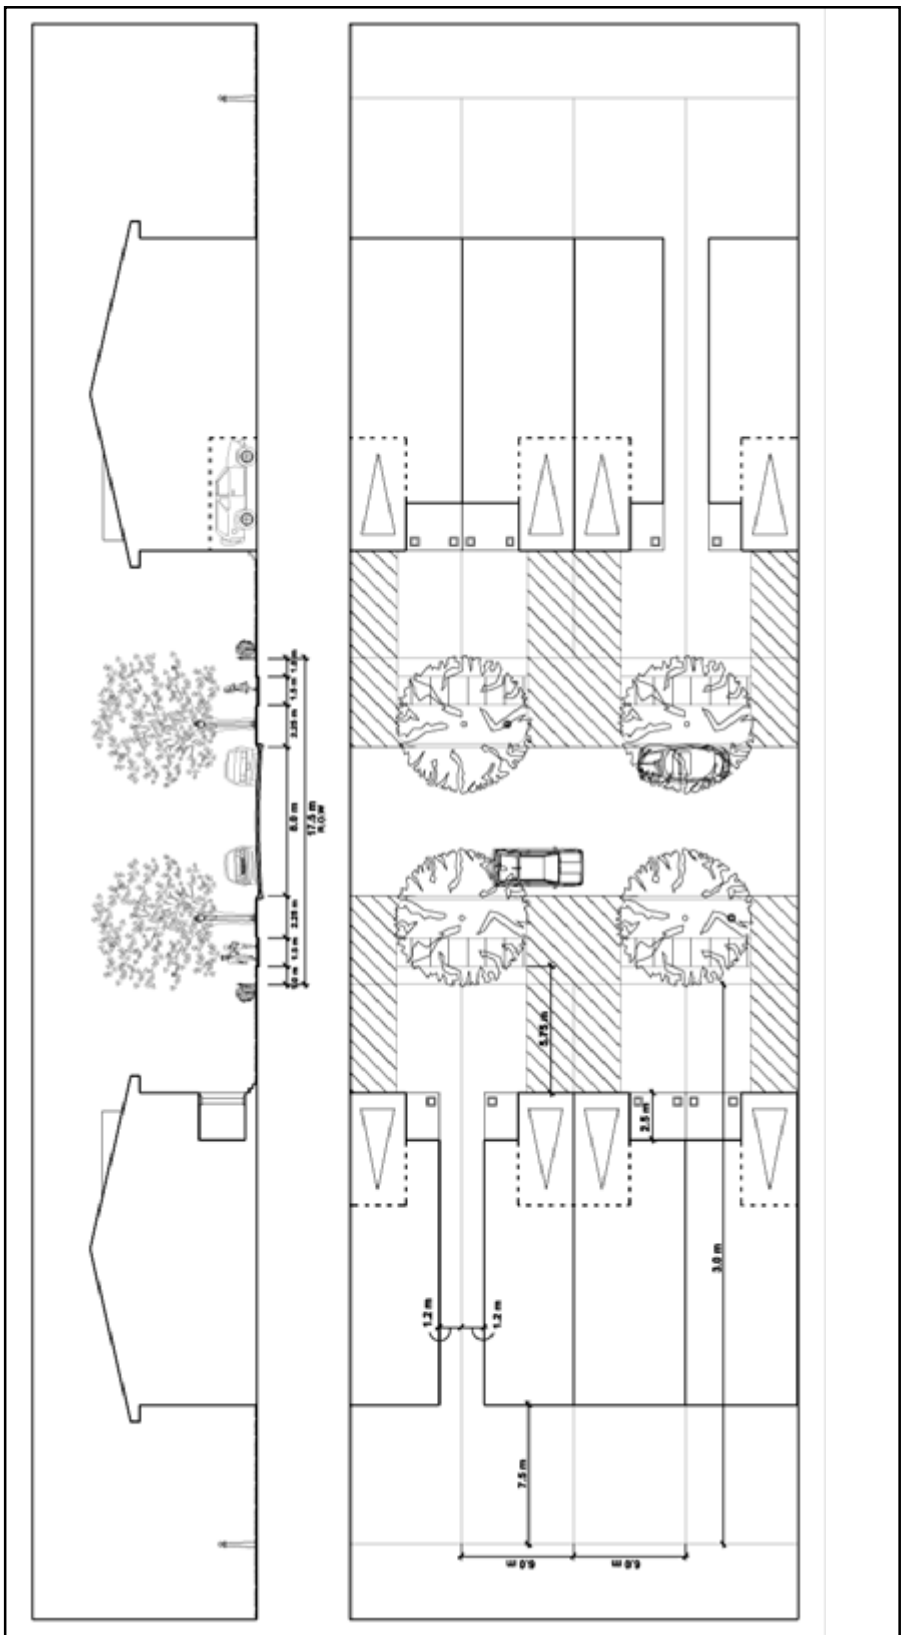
Current standards: too much house on the lot, garage and driveway dominated ont yards
